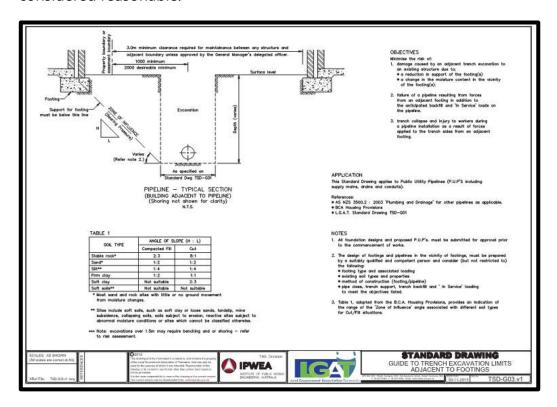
LGAT Standard Drawing – guide to trench excavation limits adjacent to footings
